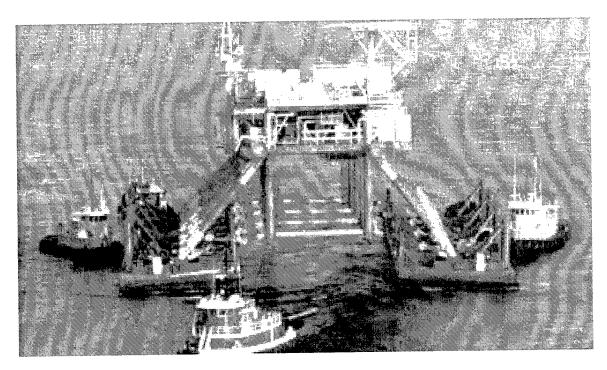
Versatruss lift system (Owner: Versatruss Americas; lift capacity: 20,000 tons)
